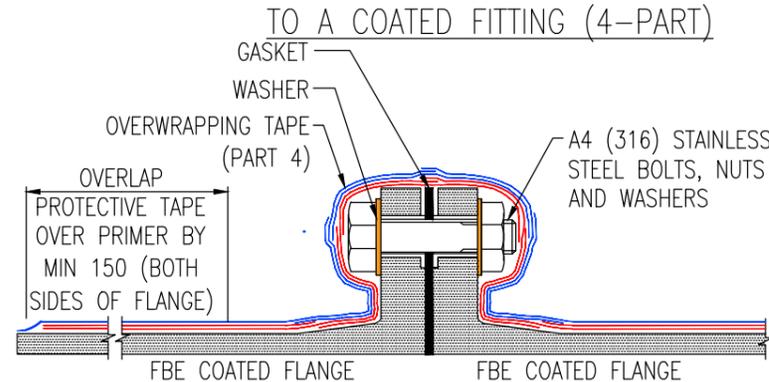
DETAIL B - CORROSION PROTECTION OF AN UNCOATED CLS FLANGE CONNECTED TO A COATED FITTING (4-PART)
